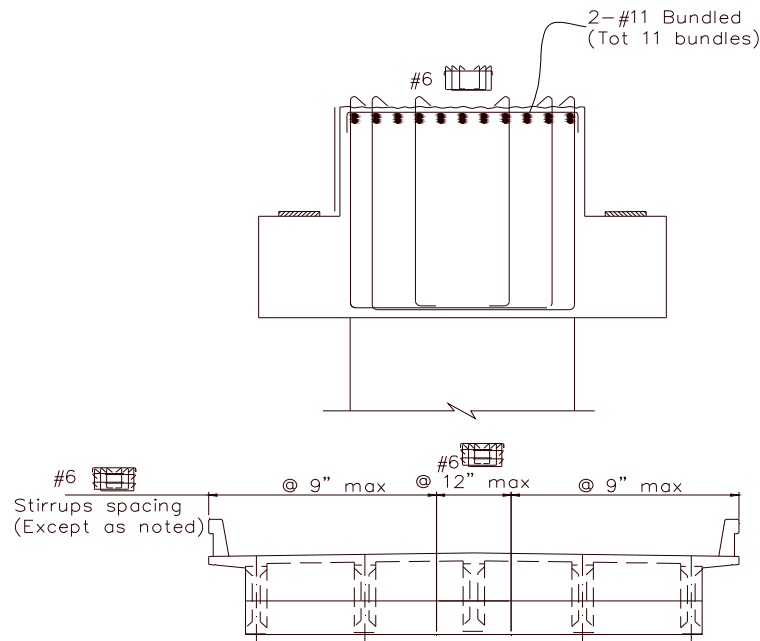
Cap Beam Reinforcement designed for Construction Loads
